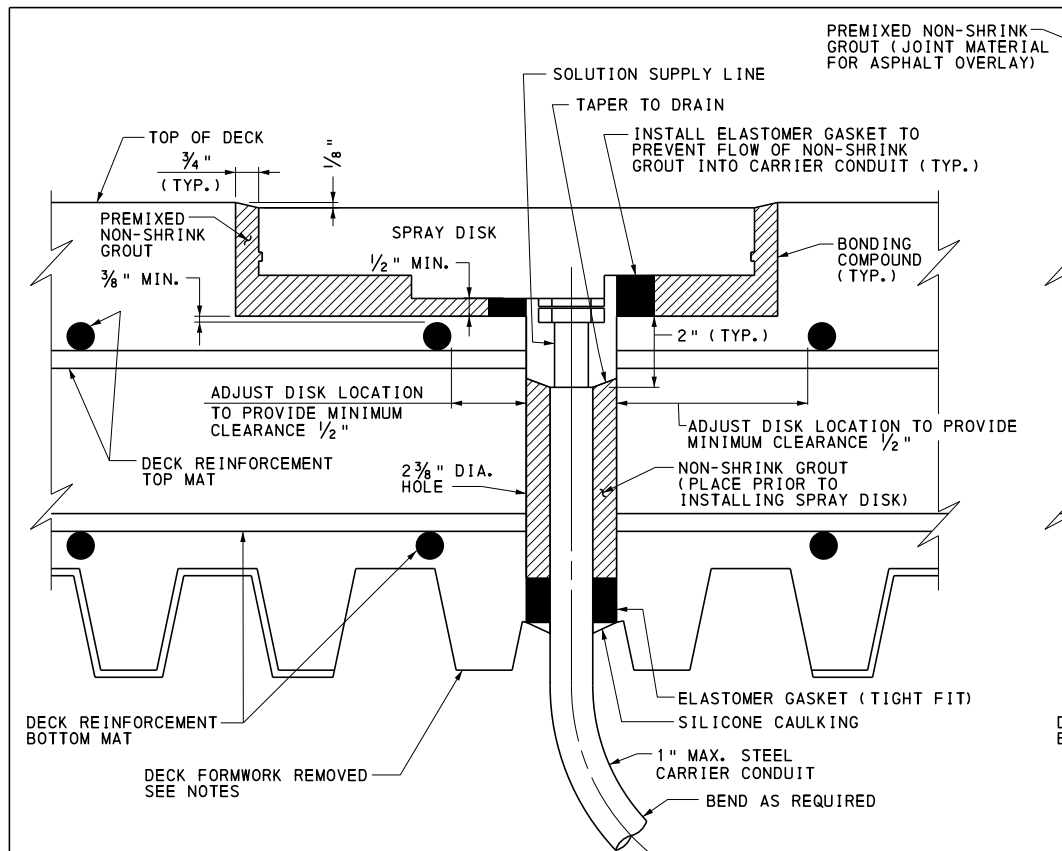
DETAIL OF BLOCKOUT FOR ACCESS HOLE
